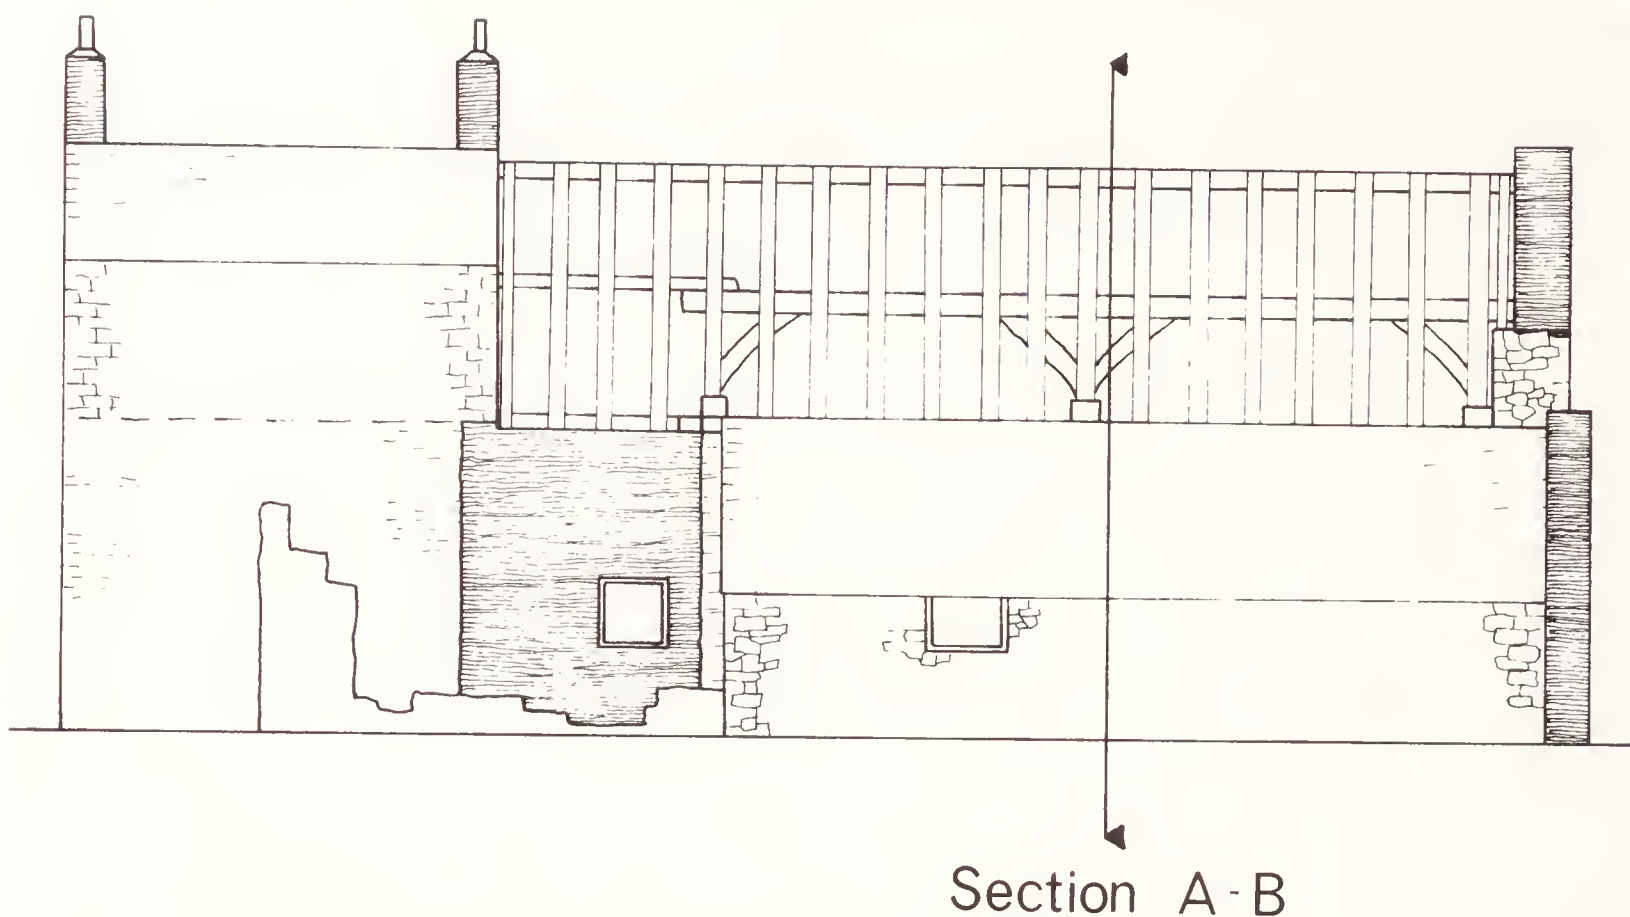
Cheesecake Hall, Oulton, north elevation.
